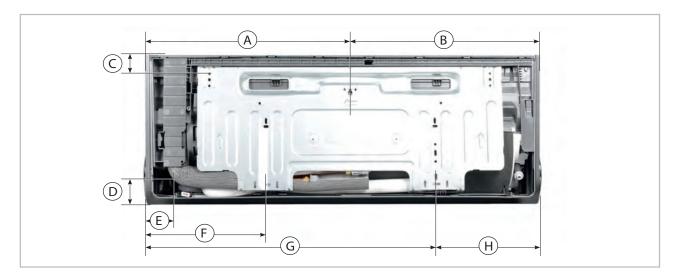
Wall bracket for indoor units ATY 266-356 DC IT (rear view)
